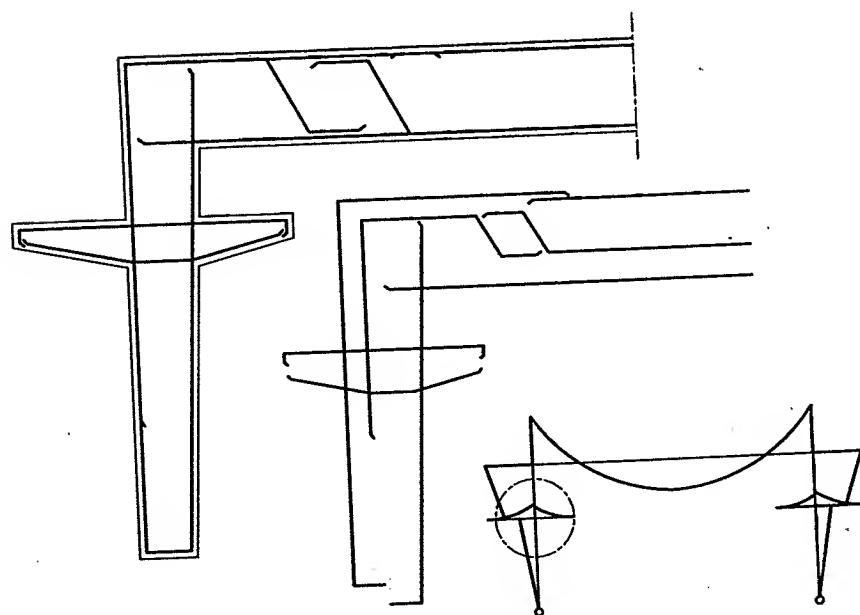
Detailing of Frame Joints (Detail-6)
